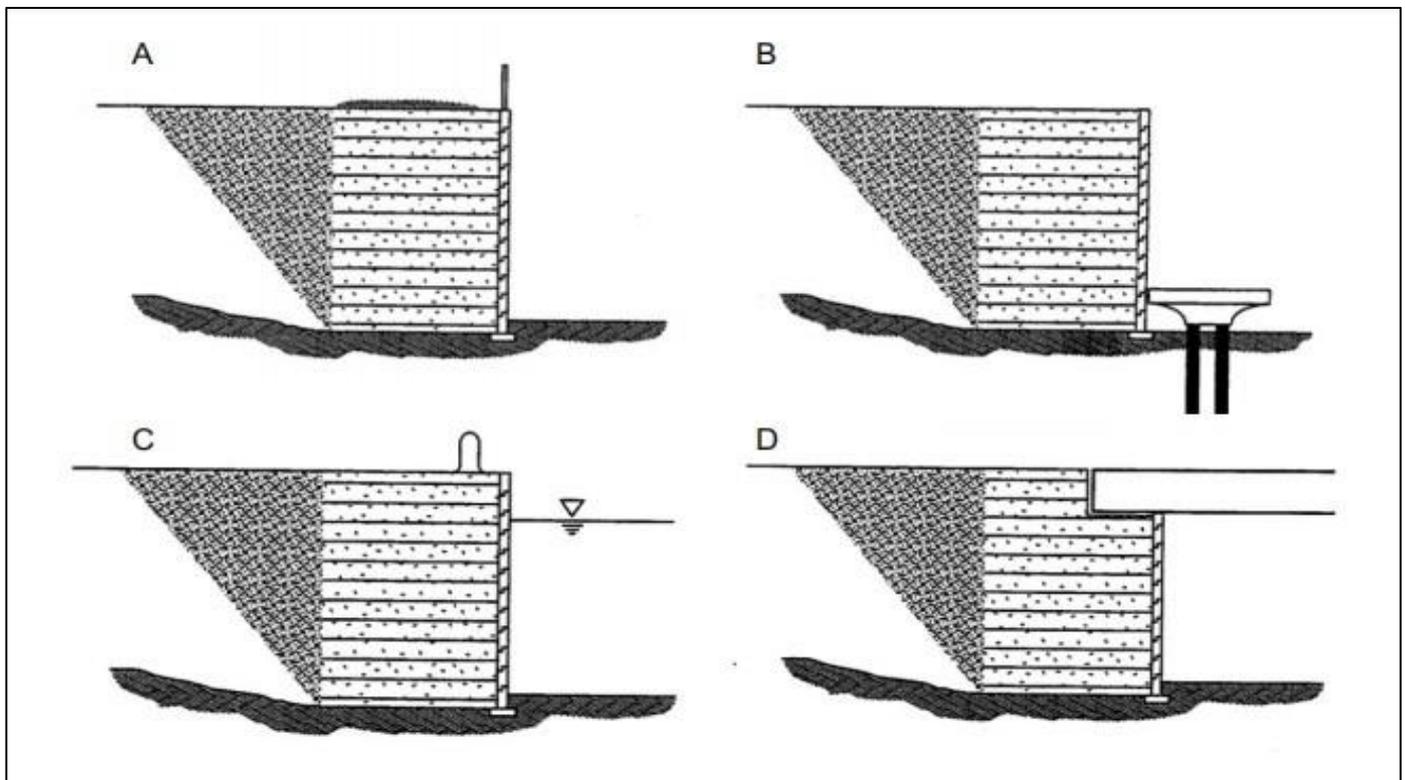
MSE Wall Applications (A) Retaining Wall; (B) Access Ramp; (C) Waterfront Structure; and (D) Rail Infrastructure / Bridge Abutment [6] (Bailleul Guillaume and Laga Matthias (2017)
